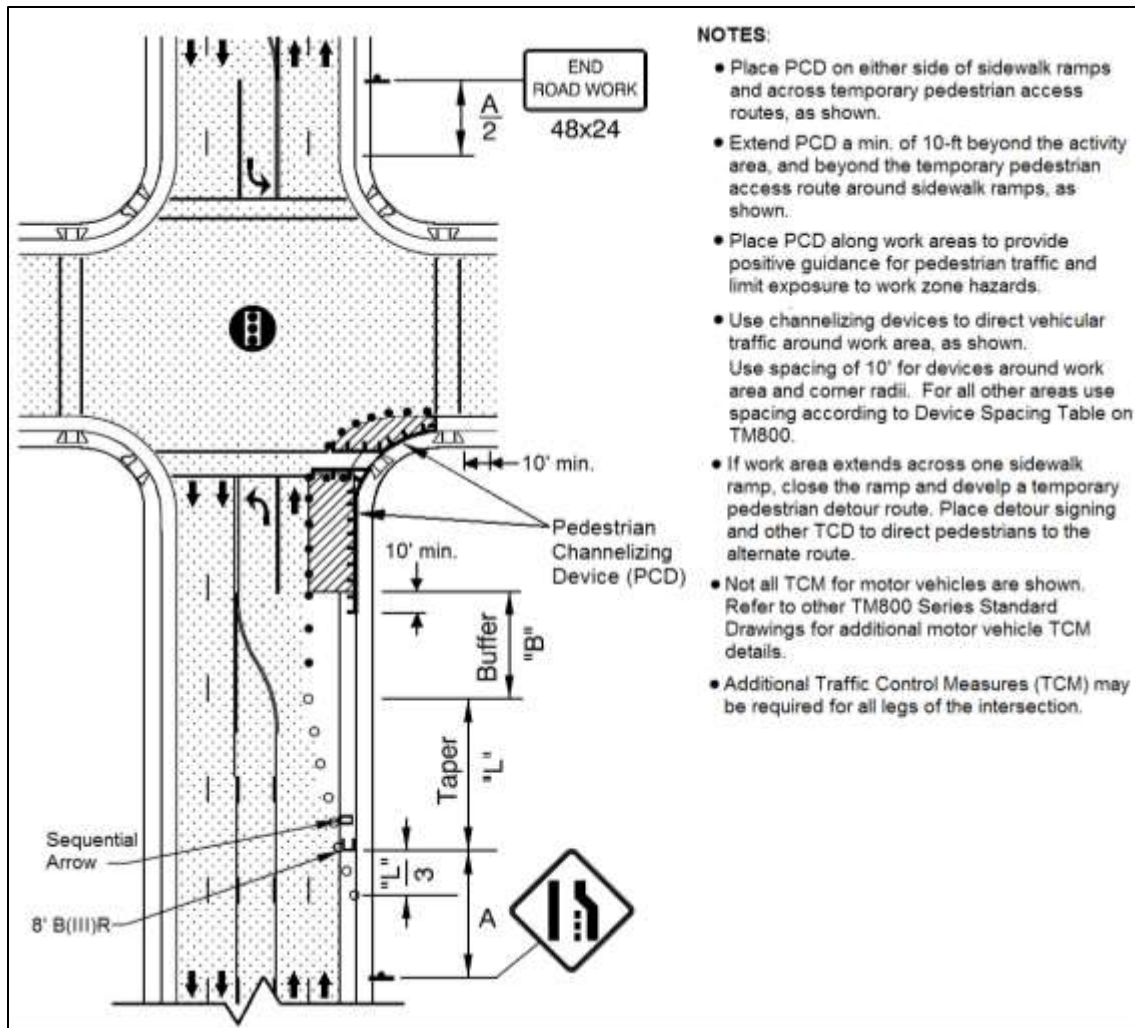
TPAR at Existing Signalized, Marked Crosswalk
